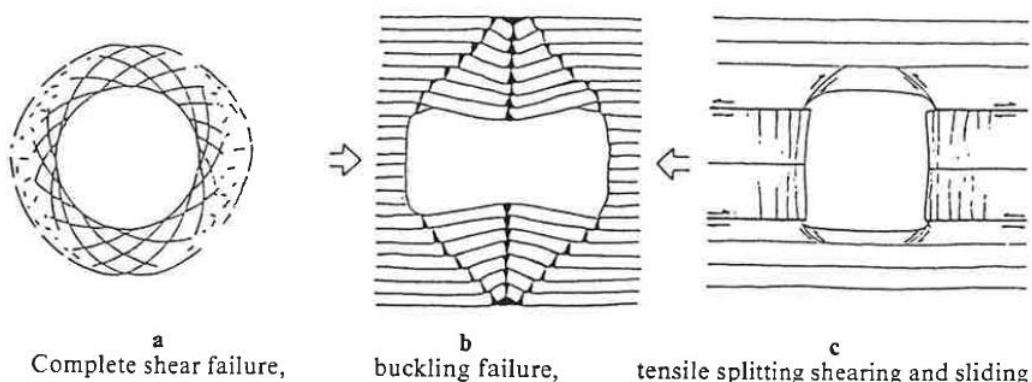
Main failure modes in overstressed ground in tunnels (Aydan et al. 1993)
